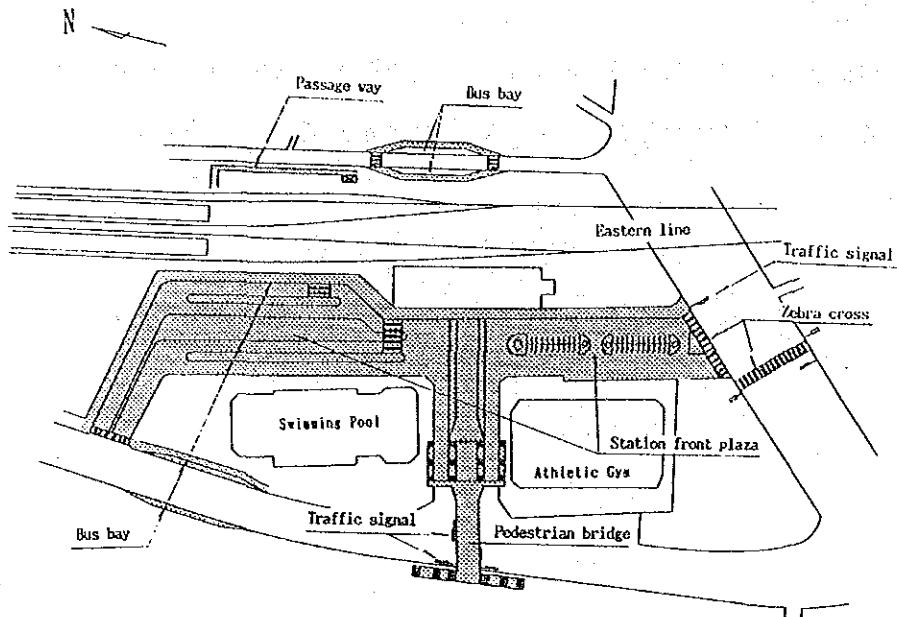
Pasar Senen Improvement Plan
